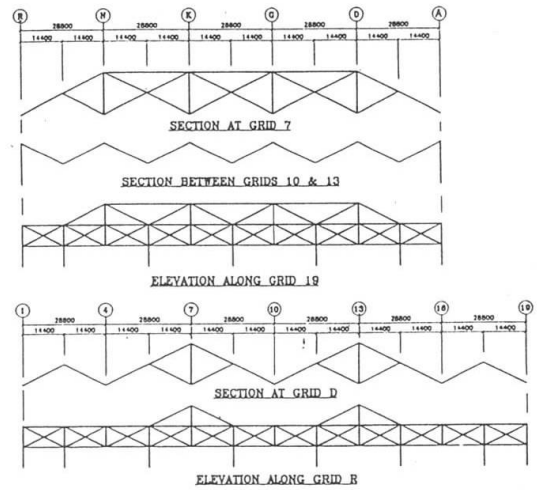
TYPICAL SECTIONS AND ELEVATIONS
